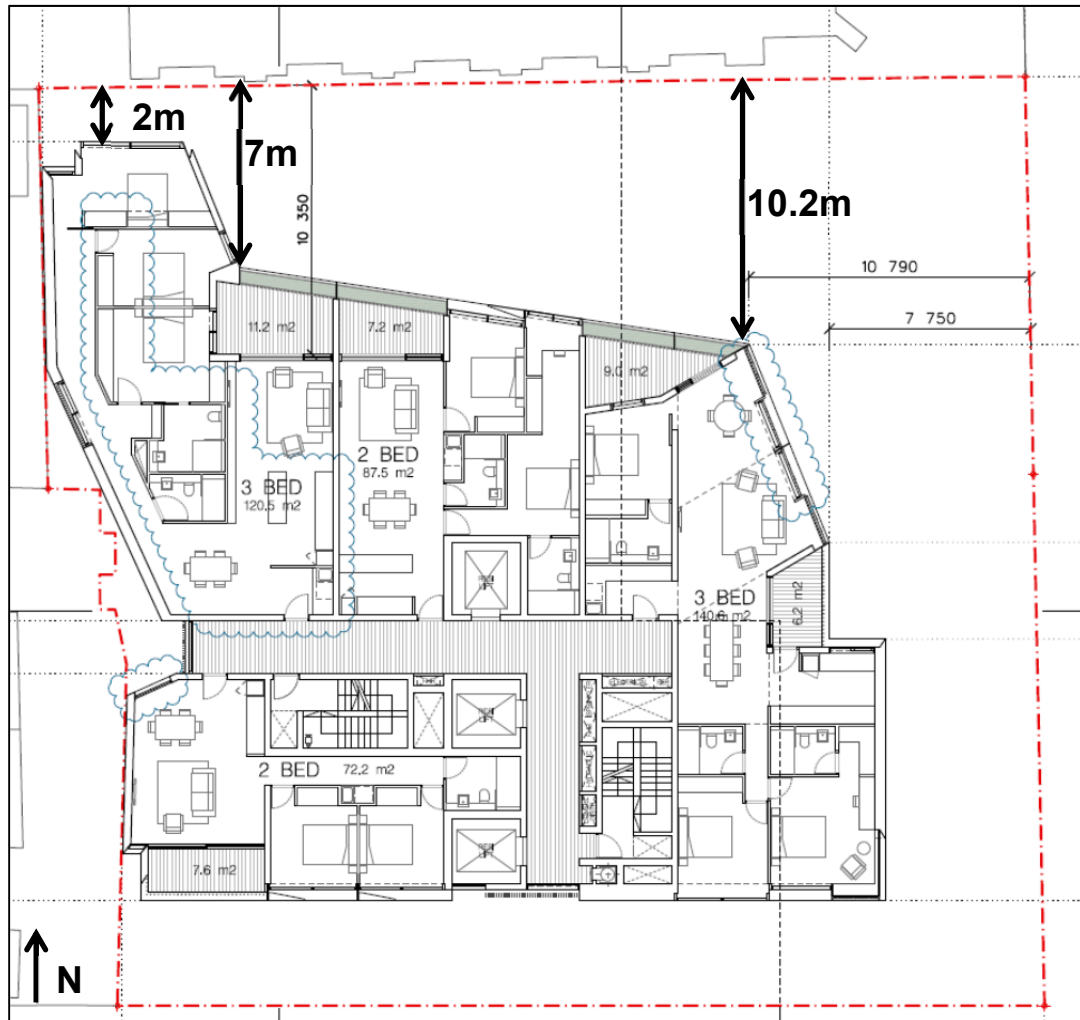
The proposed side setbacks of the tower from the northern boundary of the site (indicative mid floor tower floor plan shown)
